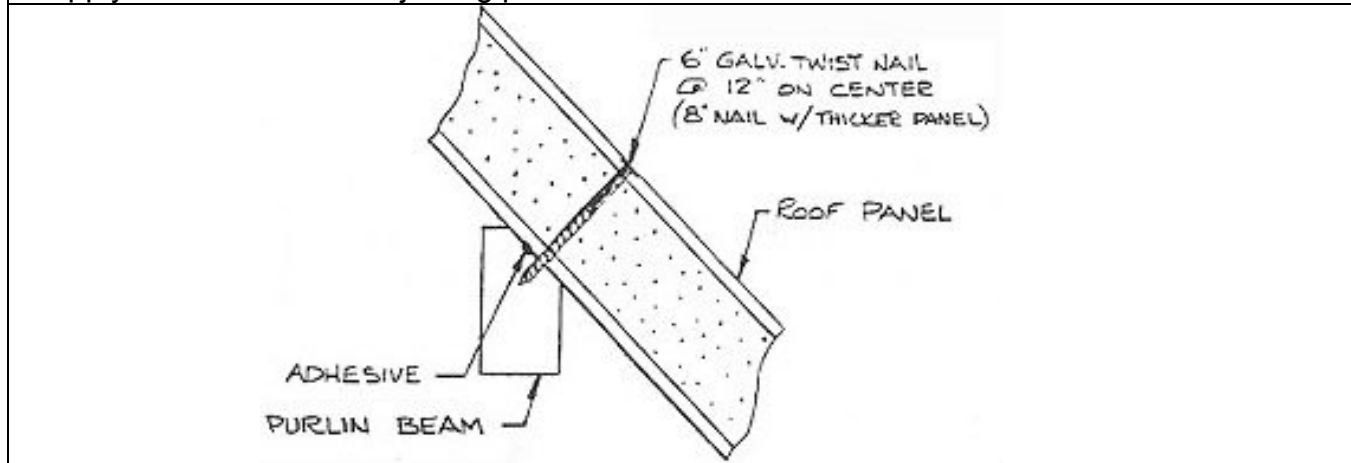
Nailing Full-Span Panel into Purlin: With full panels spanning from eave to ridge, apply adhesive on the purlin and space the nails 12" o.c.
